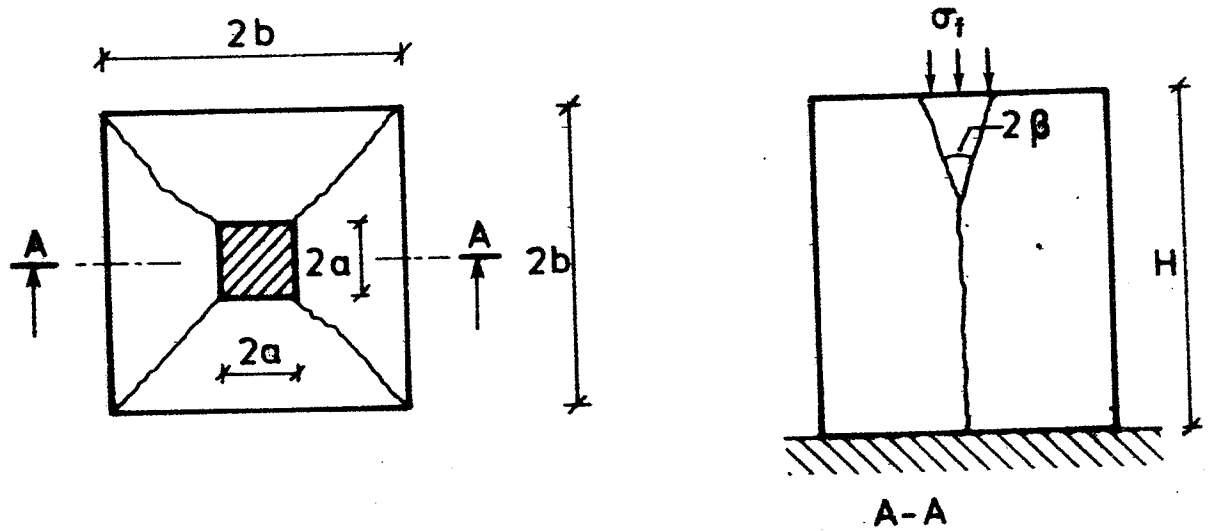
Loaded prism with 3-dimensional failure mechanism.
